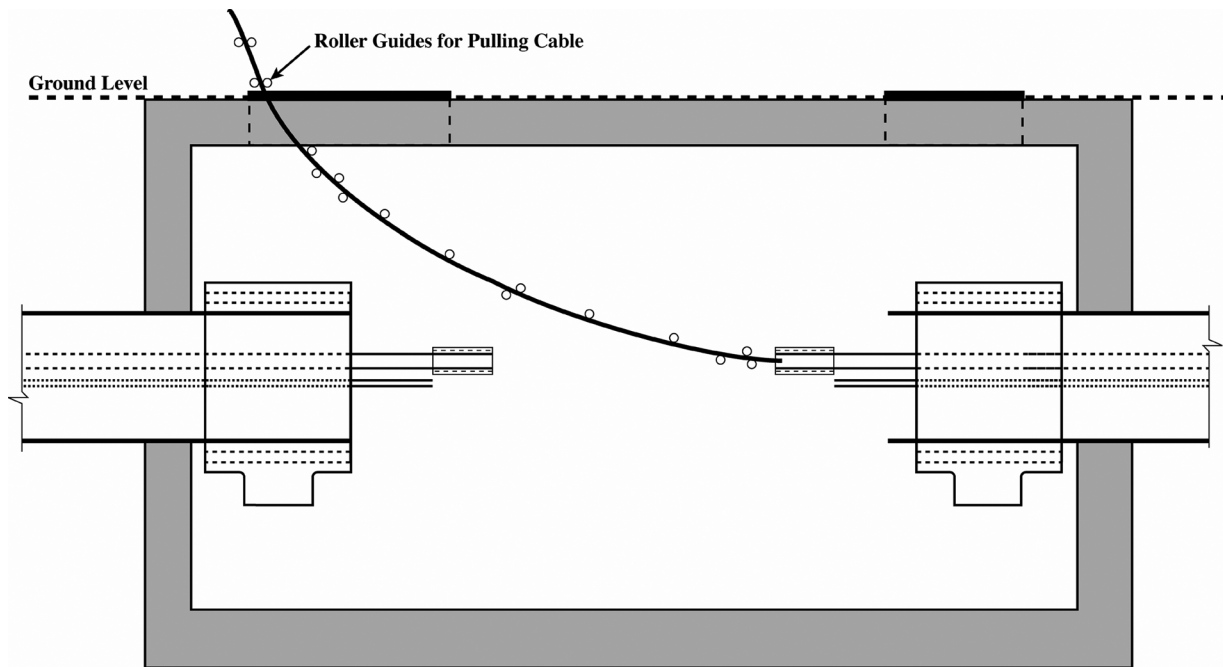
The cable splice and vacuum vaults will have pipe sections entering from each side. After splicing is completed, the collars will move to seal the vacuum and to accommodate connections to vacuum pumps.
